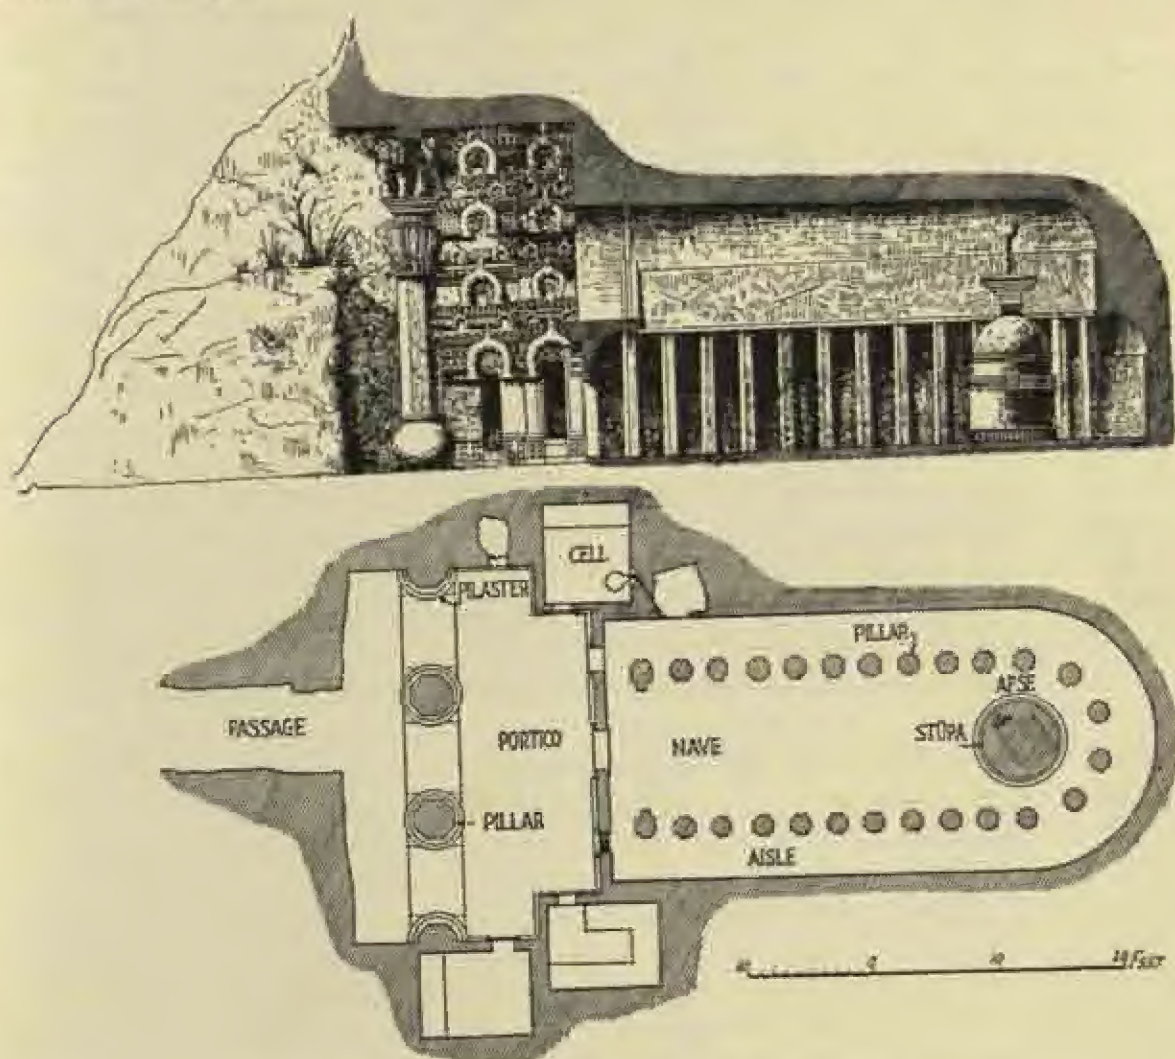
Bedse: rock-cut apsidal *chaitya-griha*, plan and section
